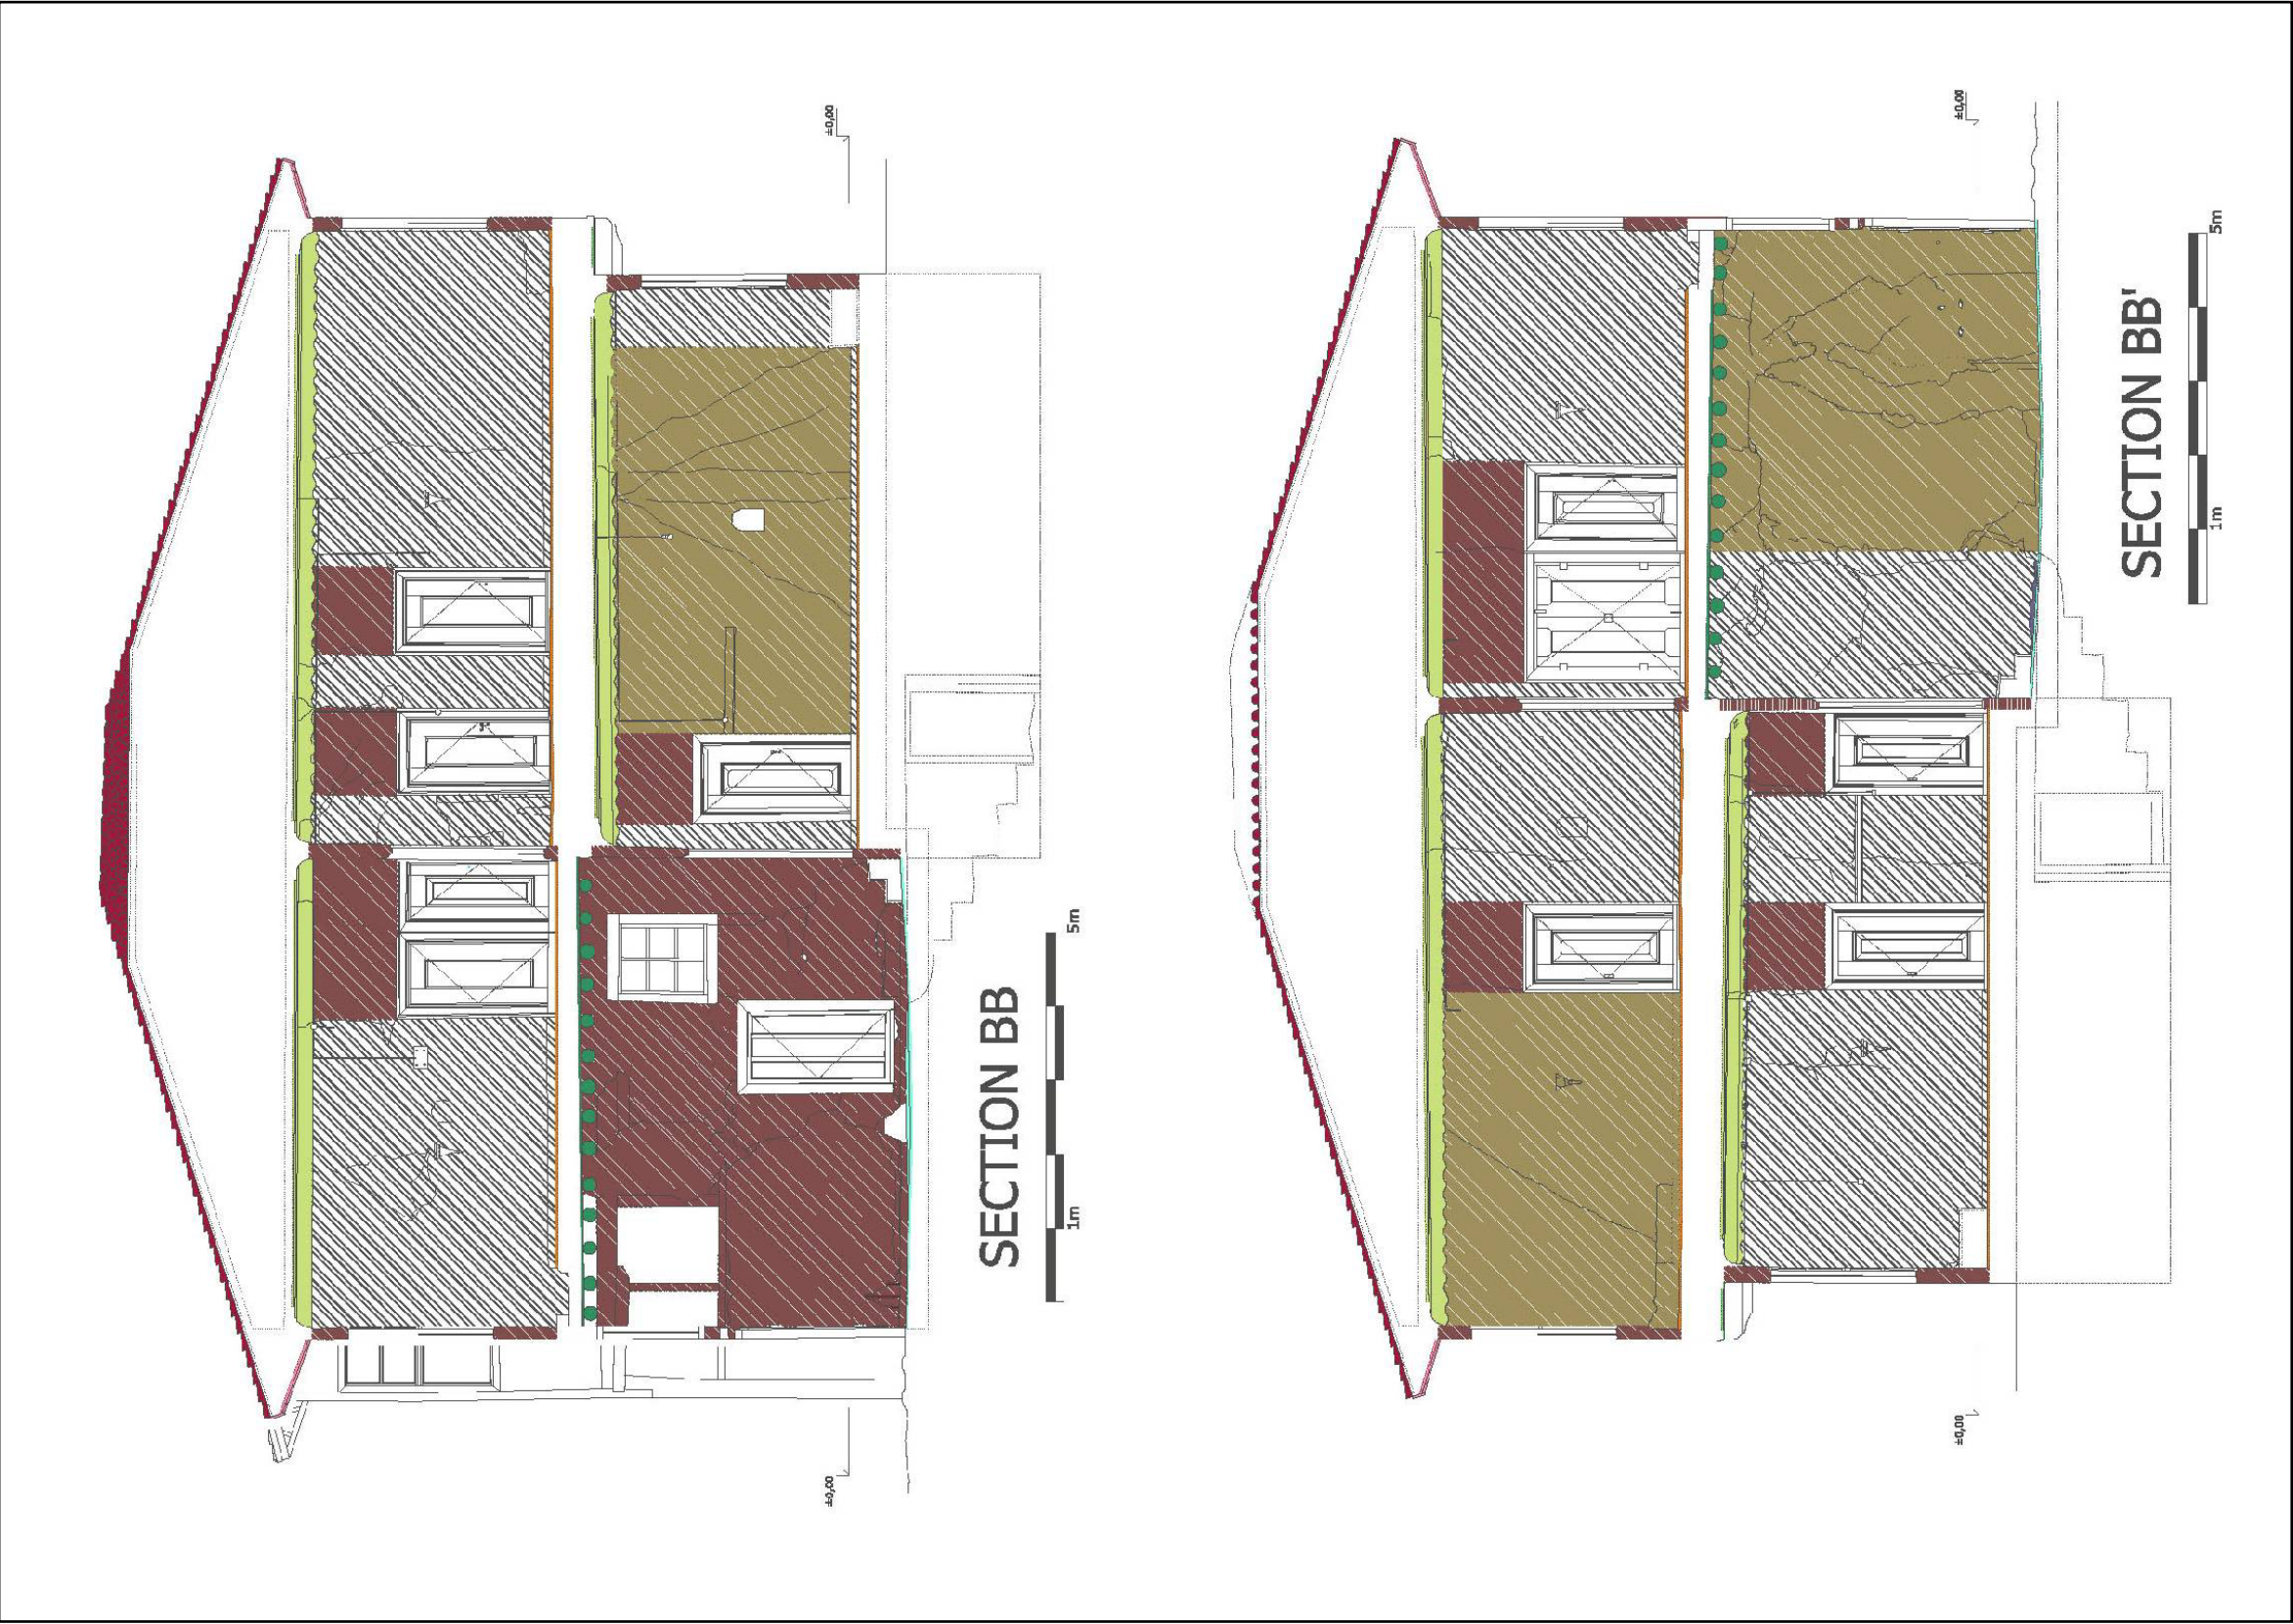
Analysis of Str. Syst. & Const. Tech.; Sections BB, BB'; 1/100 (Presented in 1/50 at Jury)
